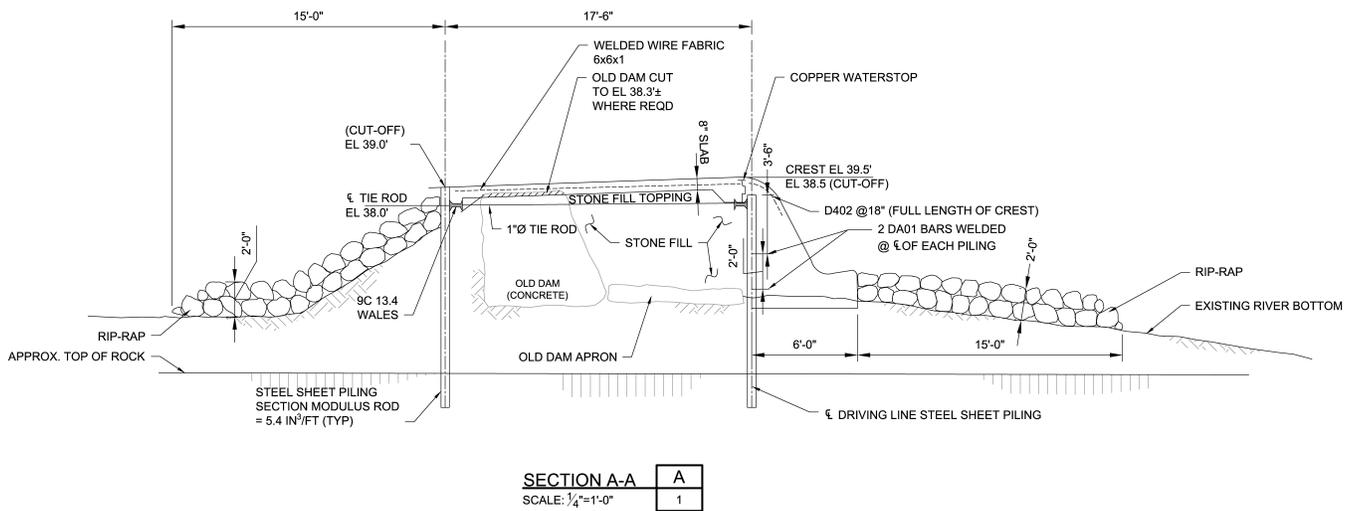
The author’s redrawn Robert Street Dam as-built profile showing the encasement of the original “Old Dam” and “Old Dam Apron” between parallel rows of steel sheet piles; river flow is from left to right.
